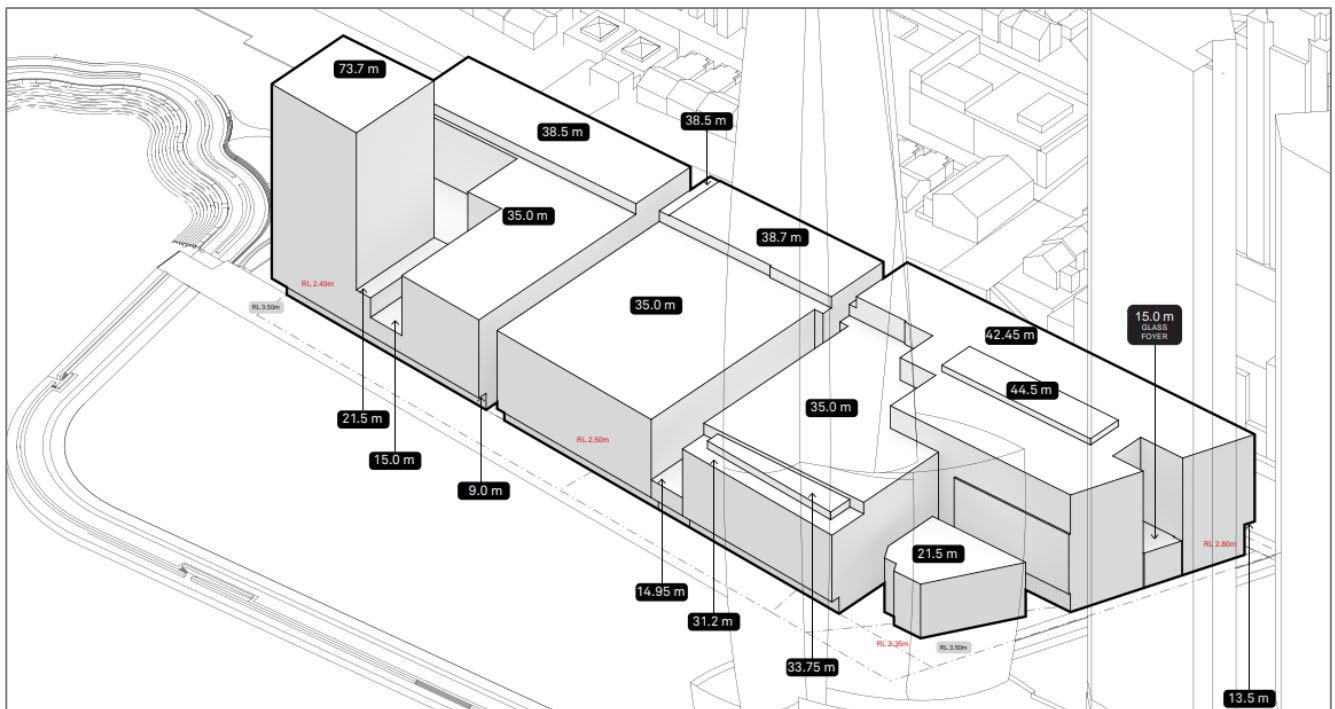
EXHIBITED CONCEPT BUILDING ENVELOPE AXONOMETRIC (HASSELL)
